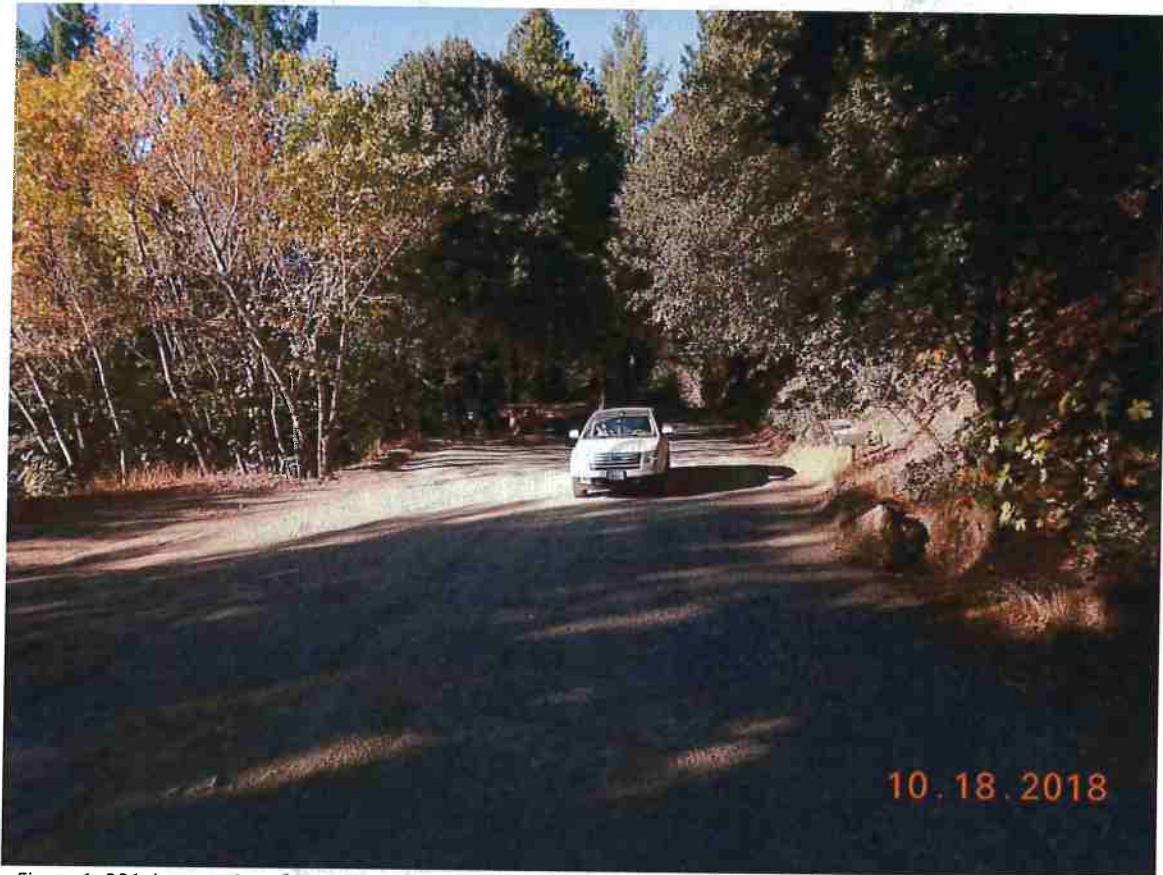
RP1. Intersection of Dutyville Rd. and Ettersburg-Honeydew Rd. 25'+ road width. No sight distance restriction. Facing north.
